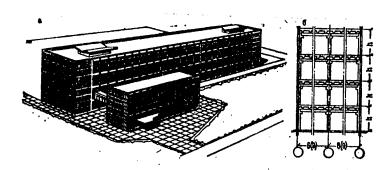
Multistory industrial building. a--General view; b--schematic section.
